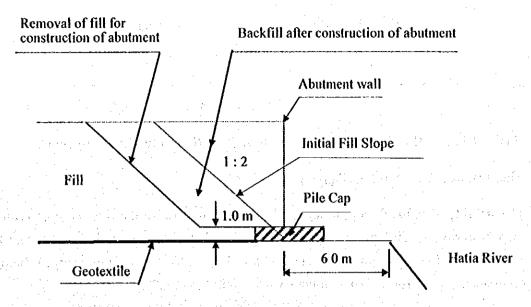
Fill in Longitudinal Direction of Hatia Bridge West Approach
